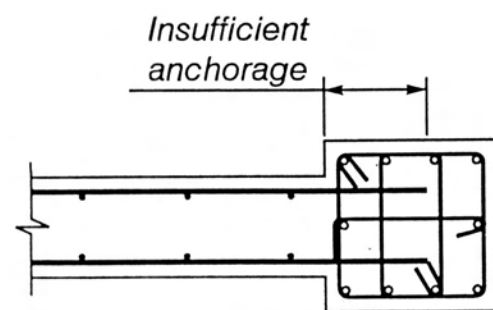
Unsatisfactory anchorage of the shear reinforcement in walls.
